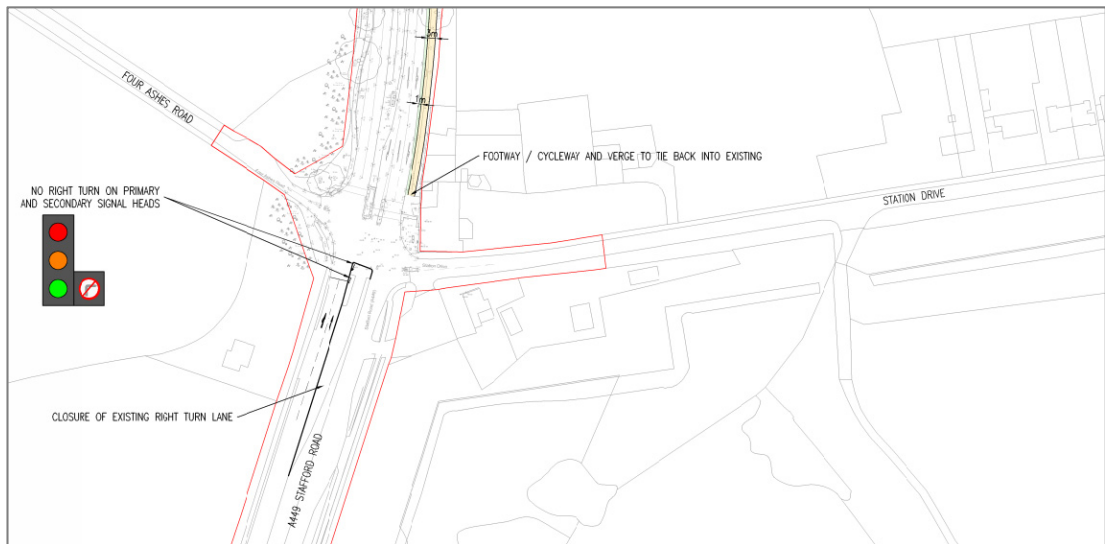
General Arrangement Plan 101 [Document 2.9A]
